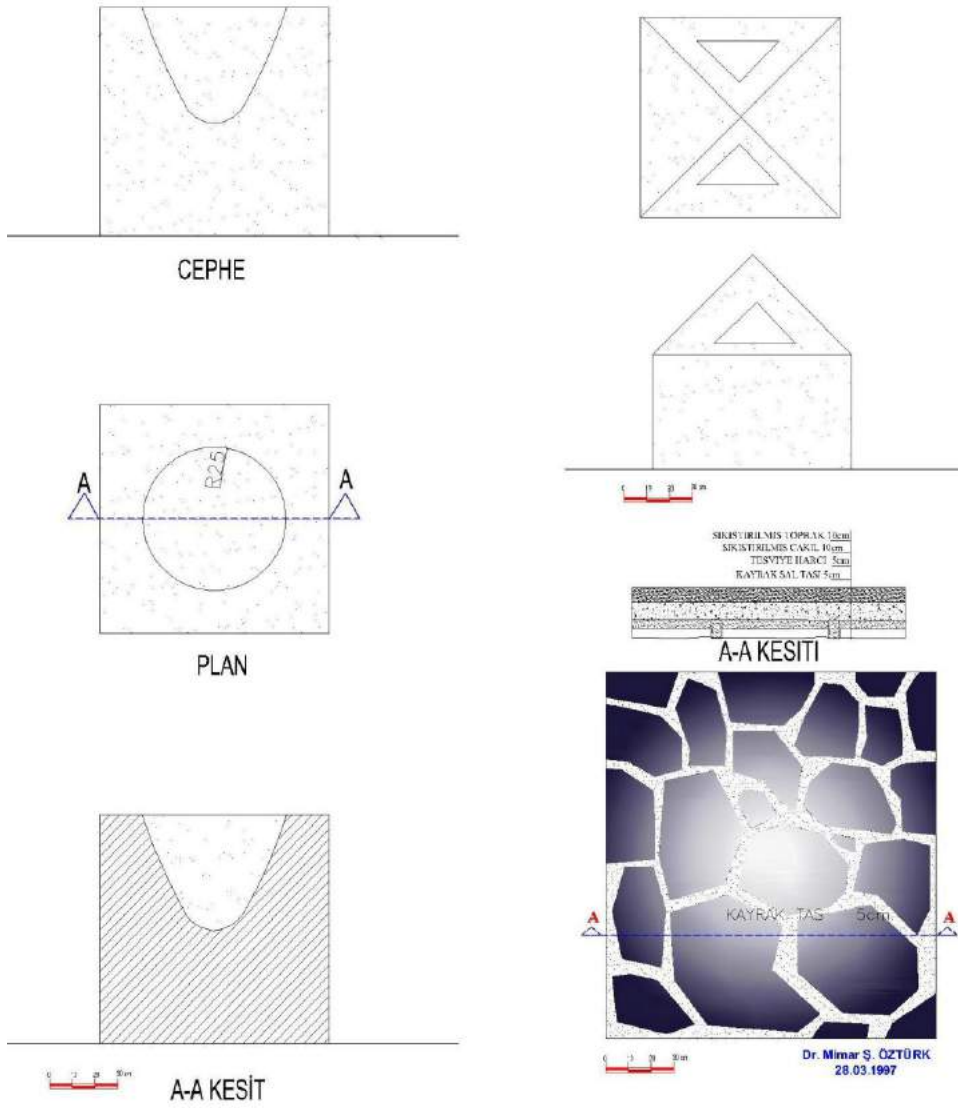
Polat Yörükoğlu House Mortar Stone, Chimney and Flagstone Details, drawn by author.
